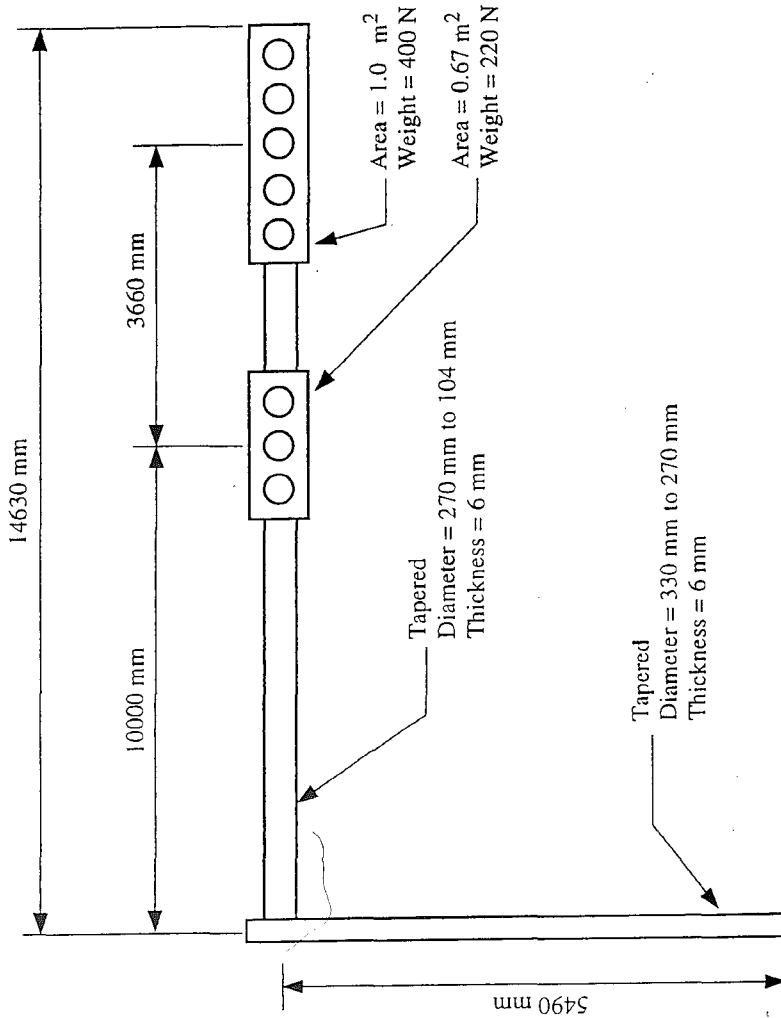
Details of Full-Scale Cantilevered Signal Support Structure (Signal Support #2).
